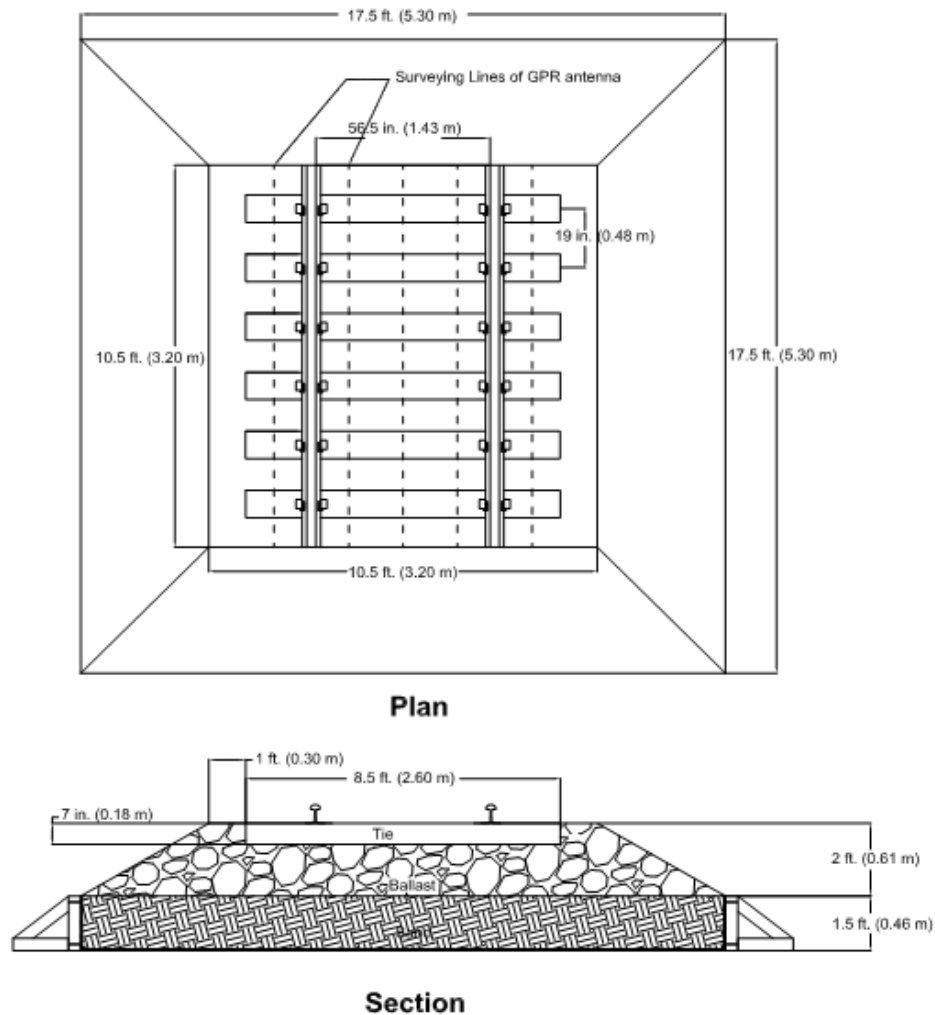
Schematic of Ballast Models with Plan View Above and Section View Below
